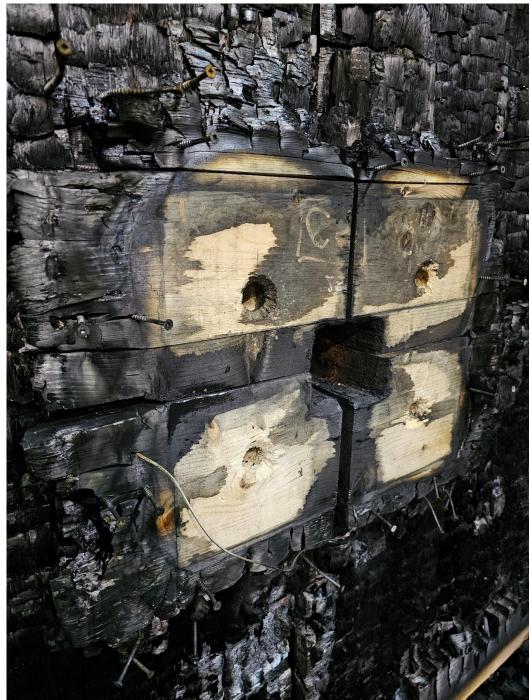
Localized damage through steel column 3 inch x 3 inch steel tube penetration through the CLT assembly.
